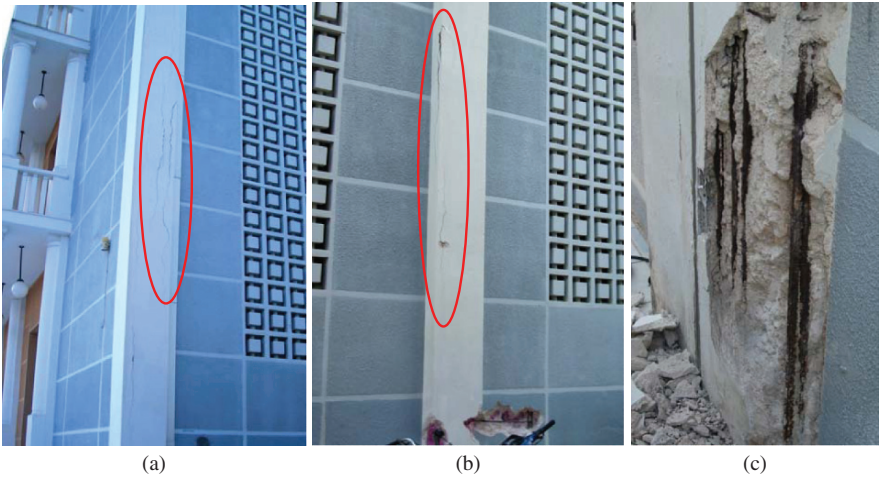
Vertical cracks in perimeter members of theatre building (a), (b), due to reinforcement corrosion (c) (See also Figure 6.13 on page 686)
